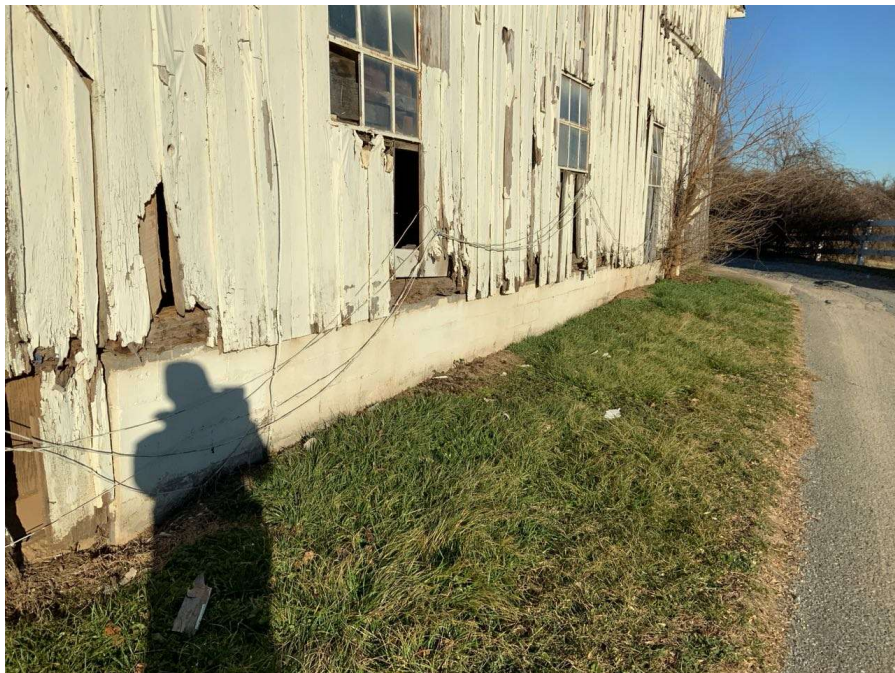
Siding along east elevation is broken or missing exposing the sill plate along Gridline T to the external environment. The sill plate is rotting.
